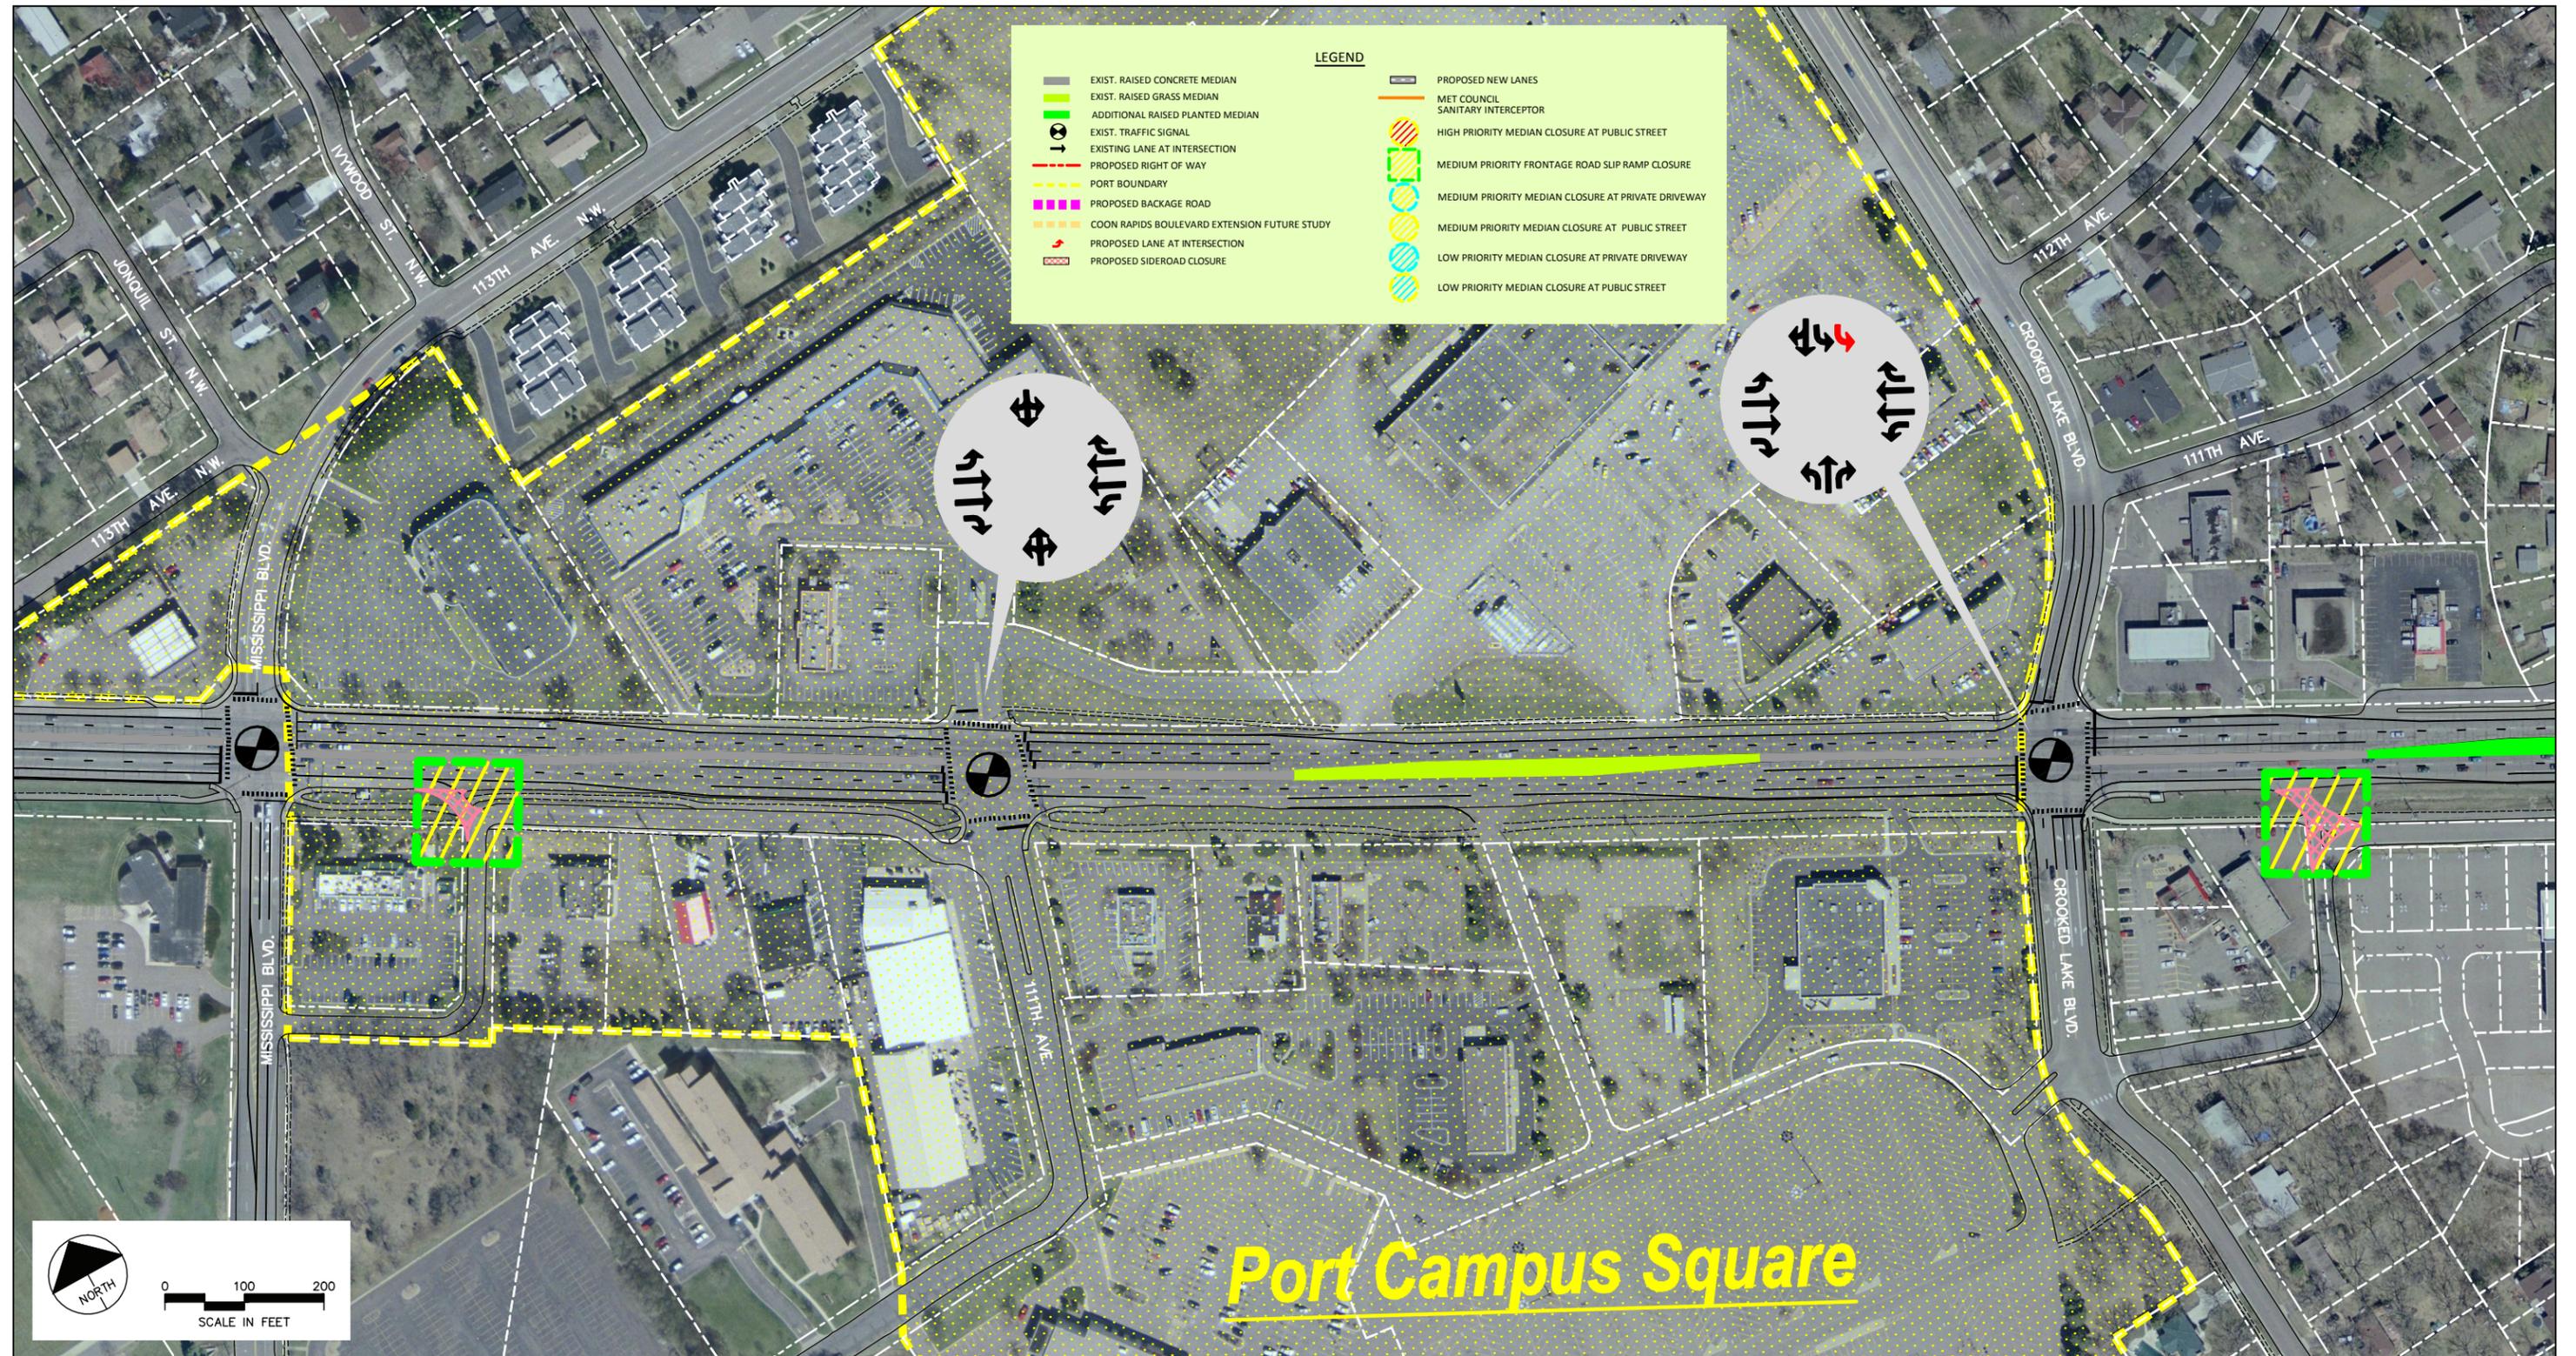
Proposed Roadway Recommendations Detail (5 of 15)
